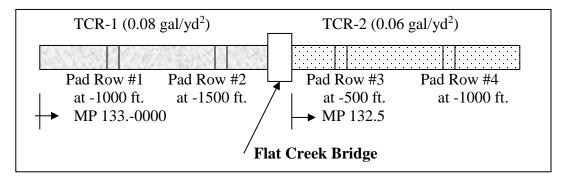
Locations and Layout for Tack Coat Rates Testing Plan
